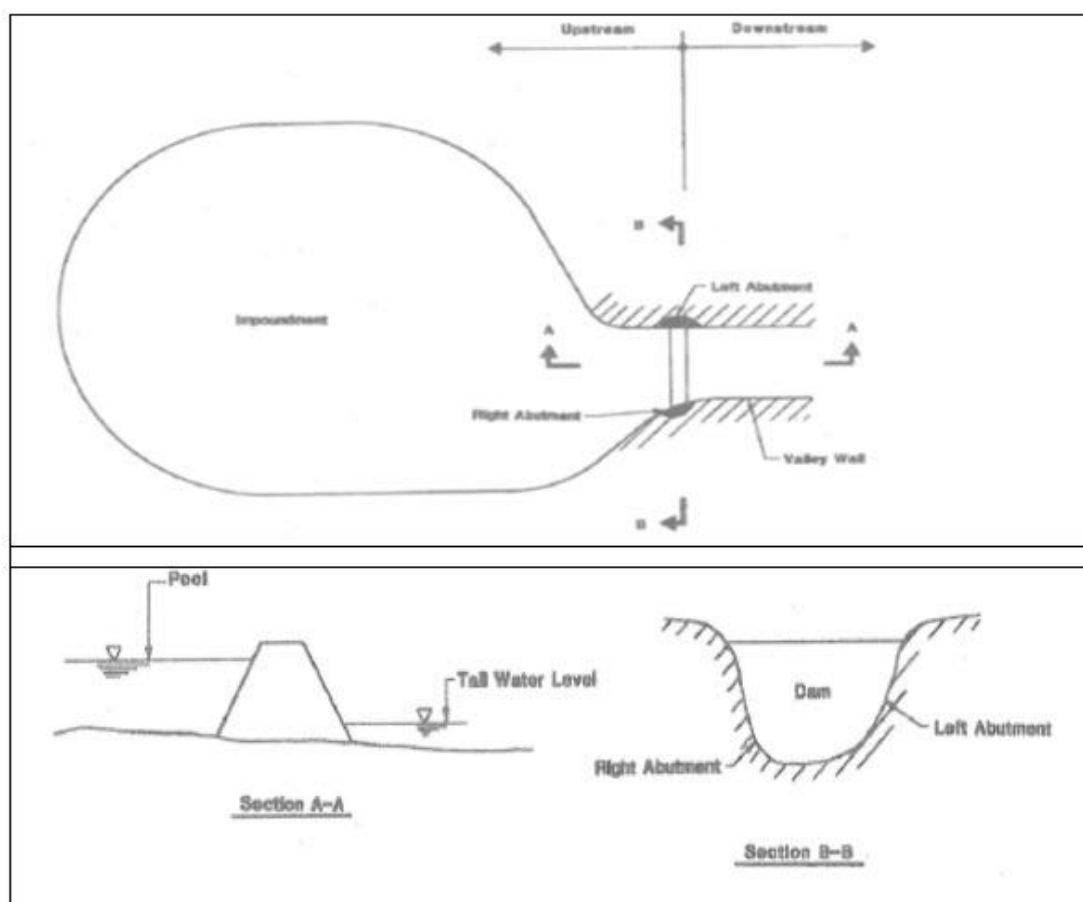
Basic nomenclature of a Dam. (Source: www.des.nh.gov)
